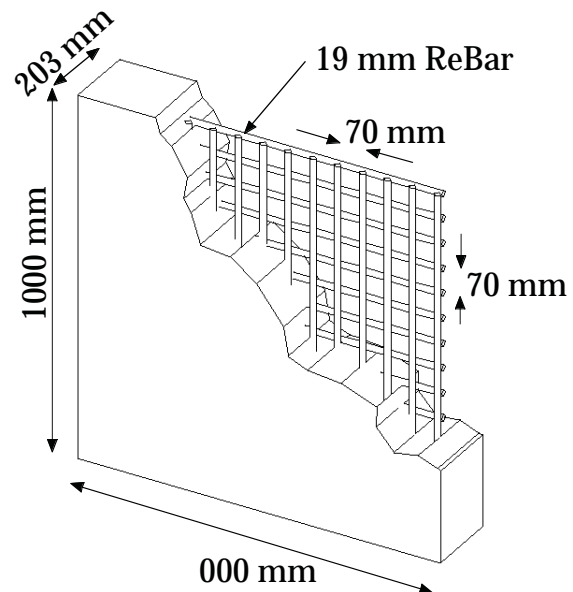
Reinforced concrete specimen RC882, nominally 203 mm thick, Batch #8 concrete mix with 2% steel.
